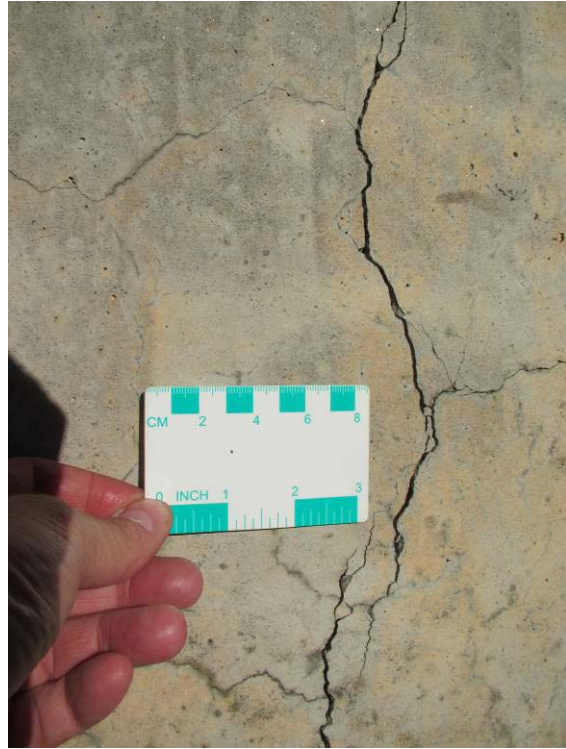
Condition of concrete columns of the South Parkway bridge over I-395.
